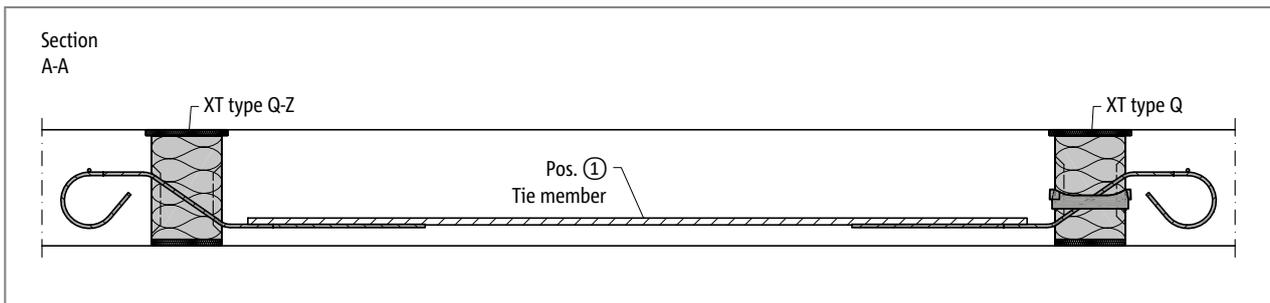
Schöck Isokorb® XT type Q-Z-V1 to Q-Z-V4, Q-V1 to Q-V4: Section A-A; one direction spanned reinforced concrete slab
